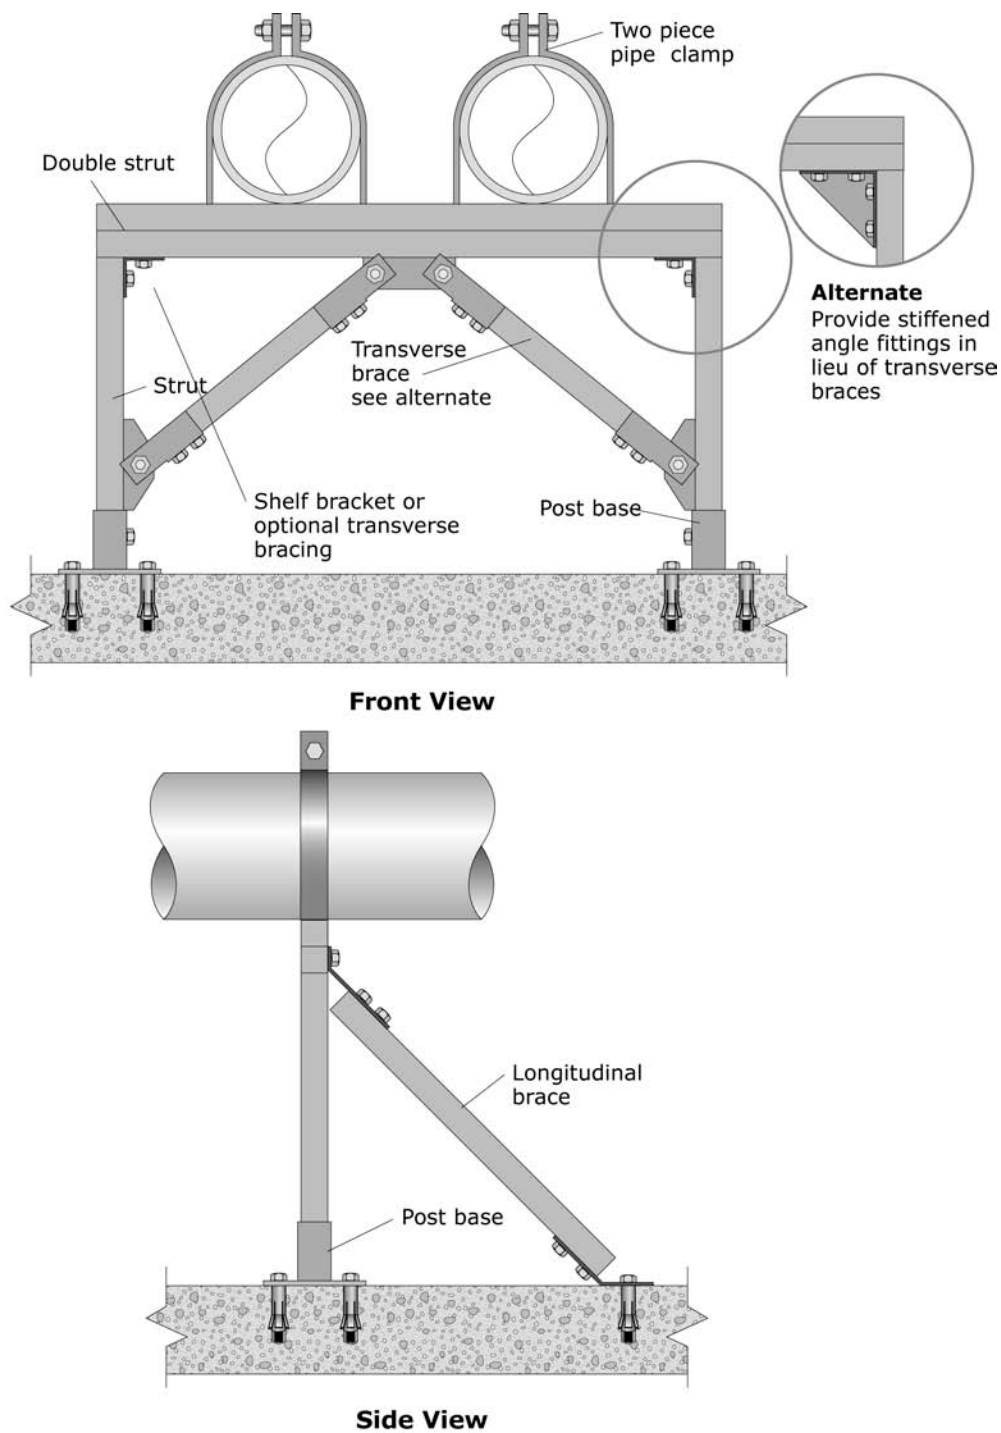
Floor-mounted pipe stand (strut frame) (ER).
